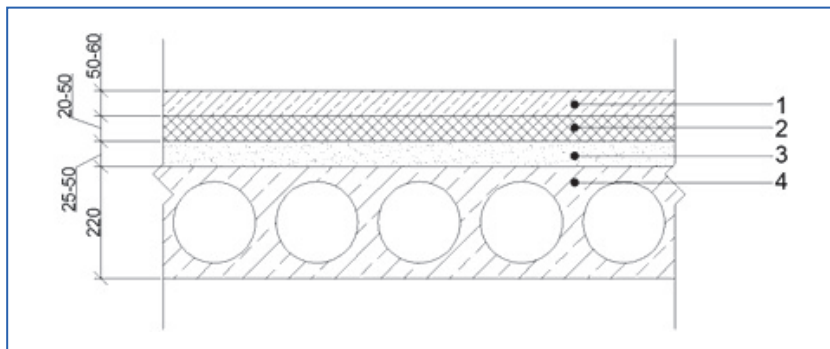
Floor construction "I-type". 1) sand/cement screed, 2) mineral wool, 3) sand, 4) reinforced hollow concrete slab.
